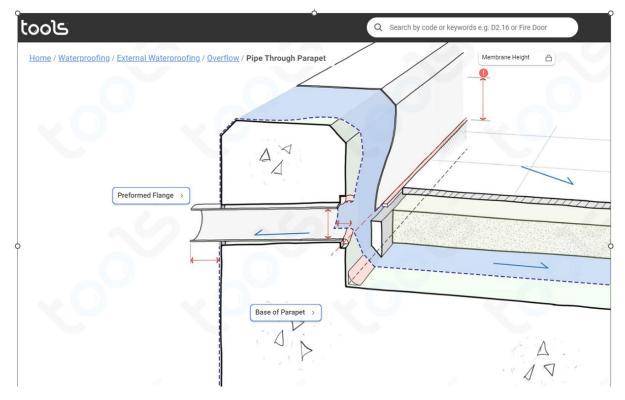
Home – Tools™ (buildingtools.co). Roof parapet detail. Source: (Tools, Accessed 2023)
